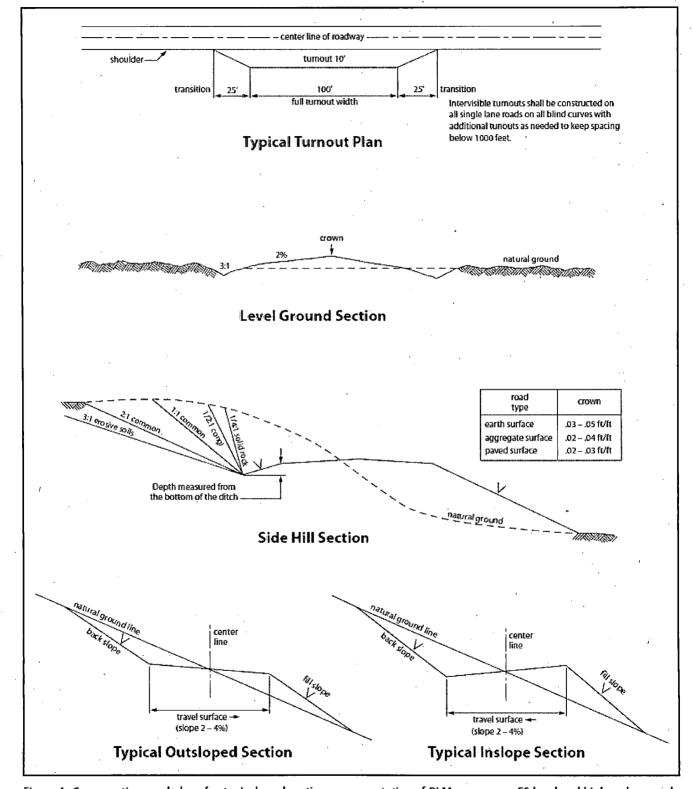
Cross-sections and plans for typical road sections representative of BLM resource or FS local and higher-class roads.
